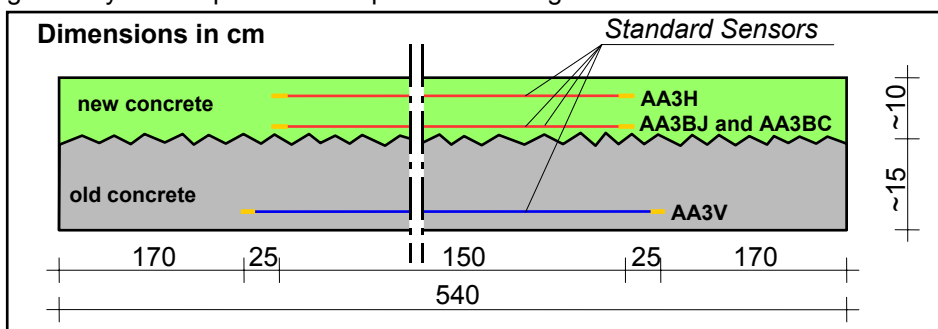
Geometry and sensor emplacement in hybrid old concrete-new concrete specimen AA3.
